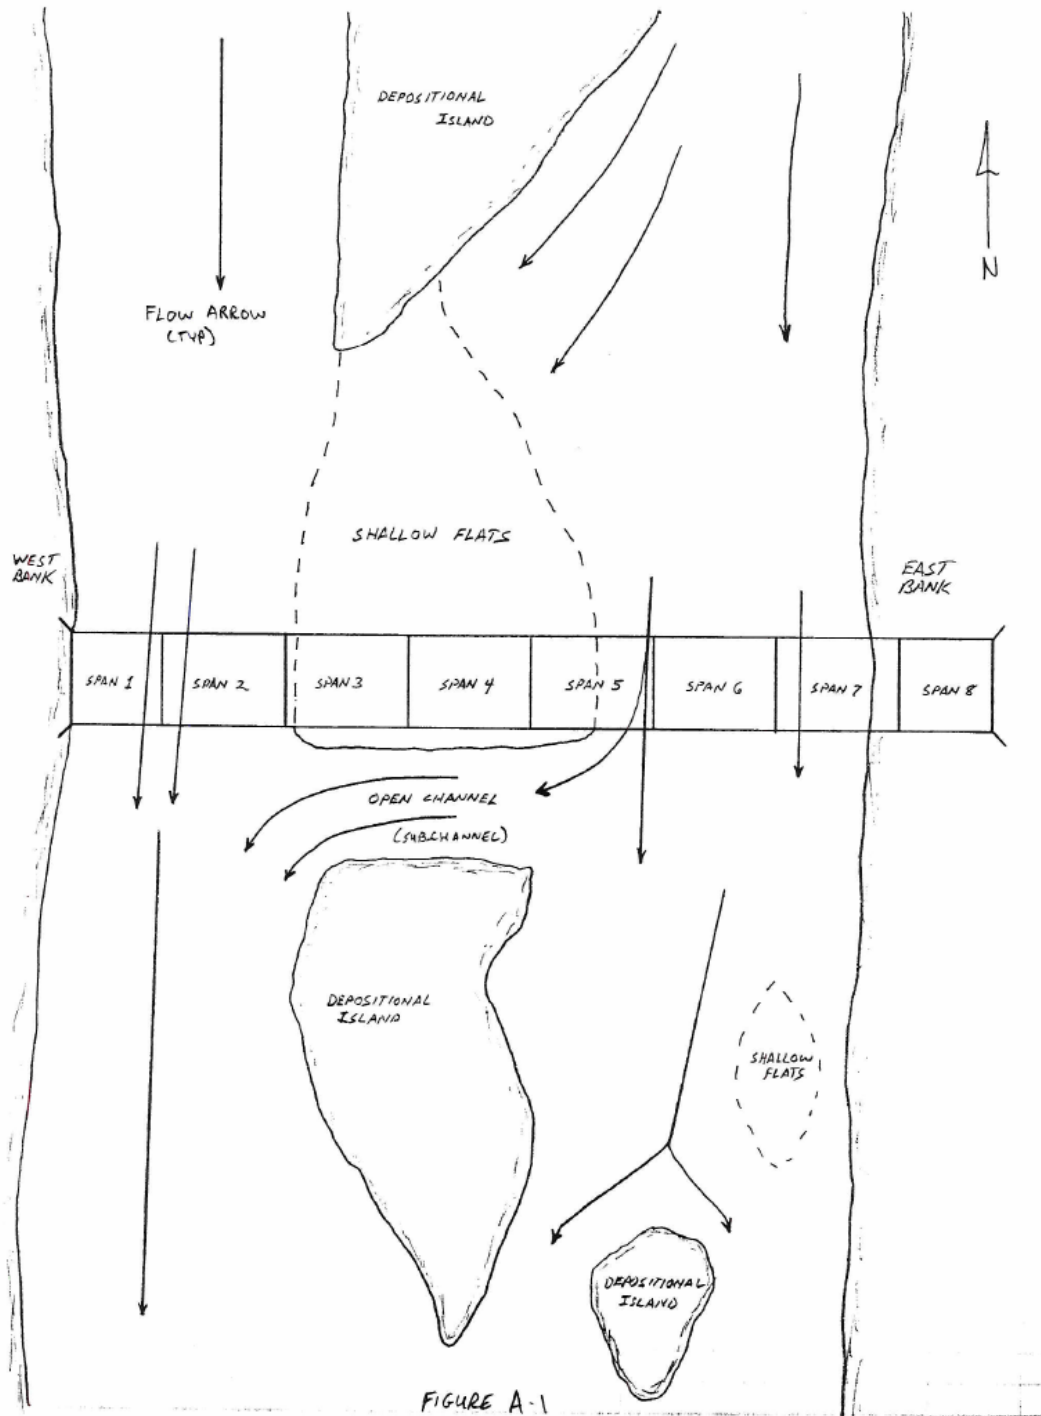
Underwater Inspection Report Plan View of Green River Bridge, 1999
